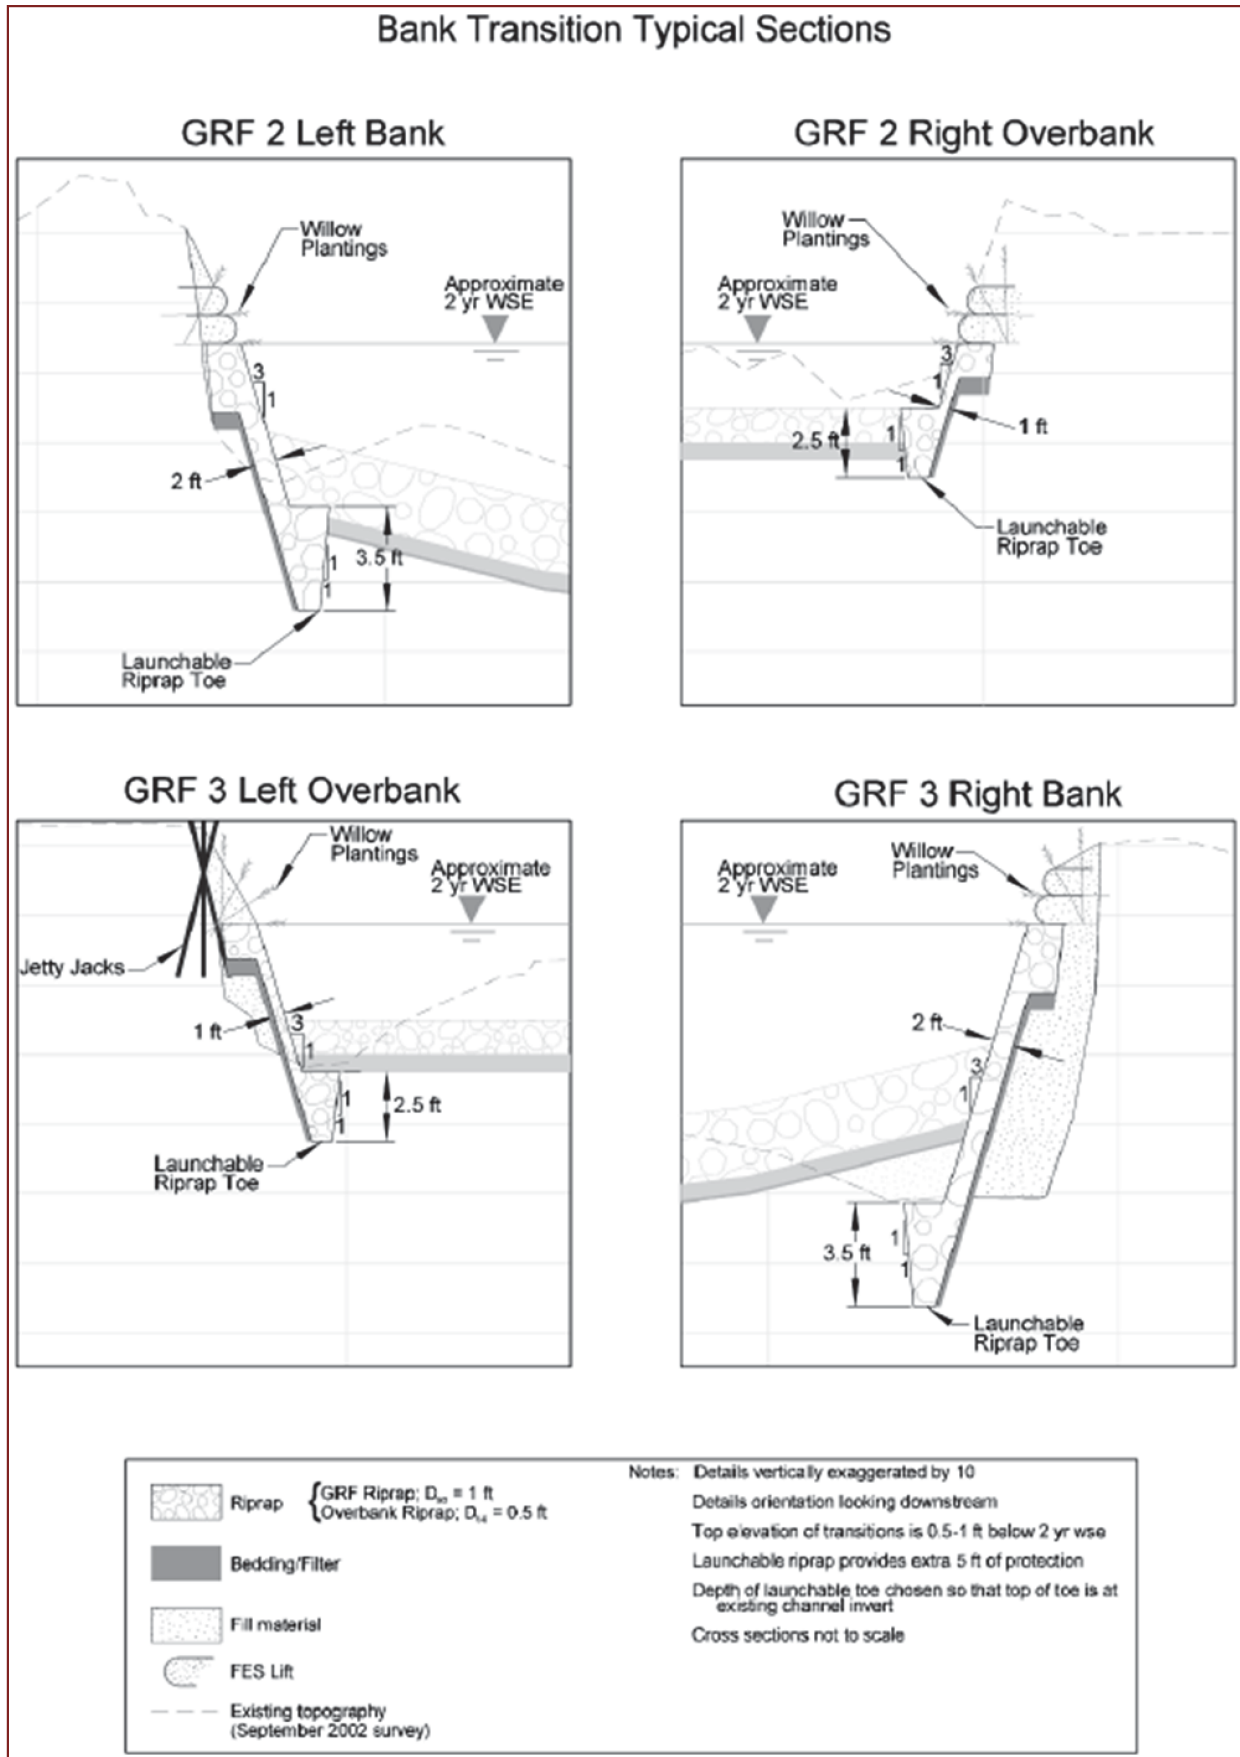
Typical sections of bank transitions (Ayres Associates 2003).
